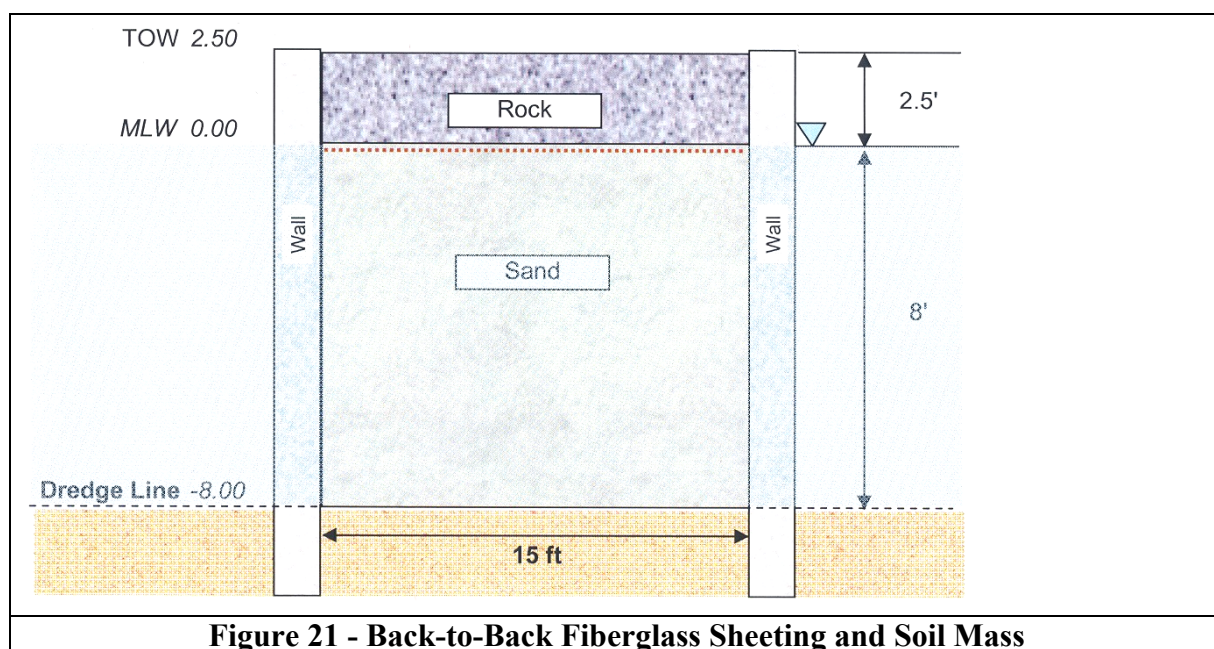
Back-to-Back Fiberglass Sheet Piling and Soil Mass
